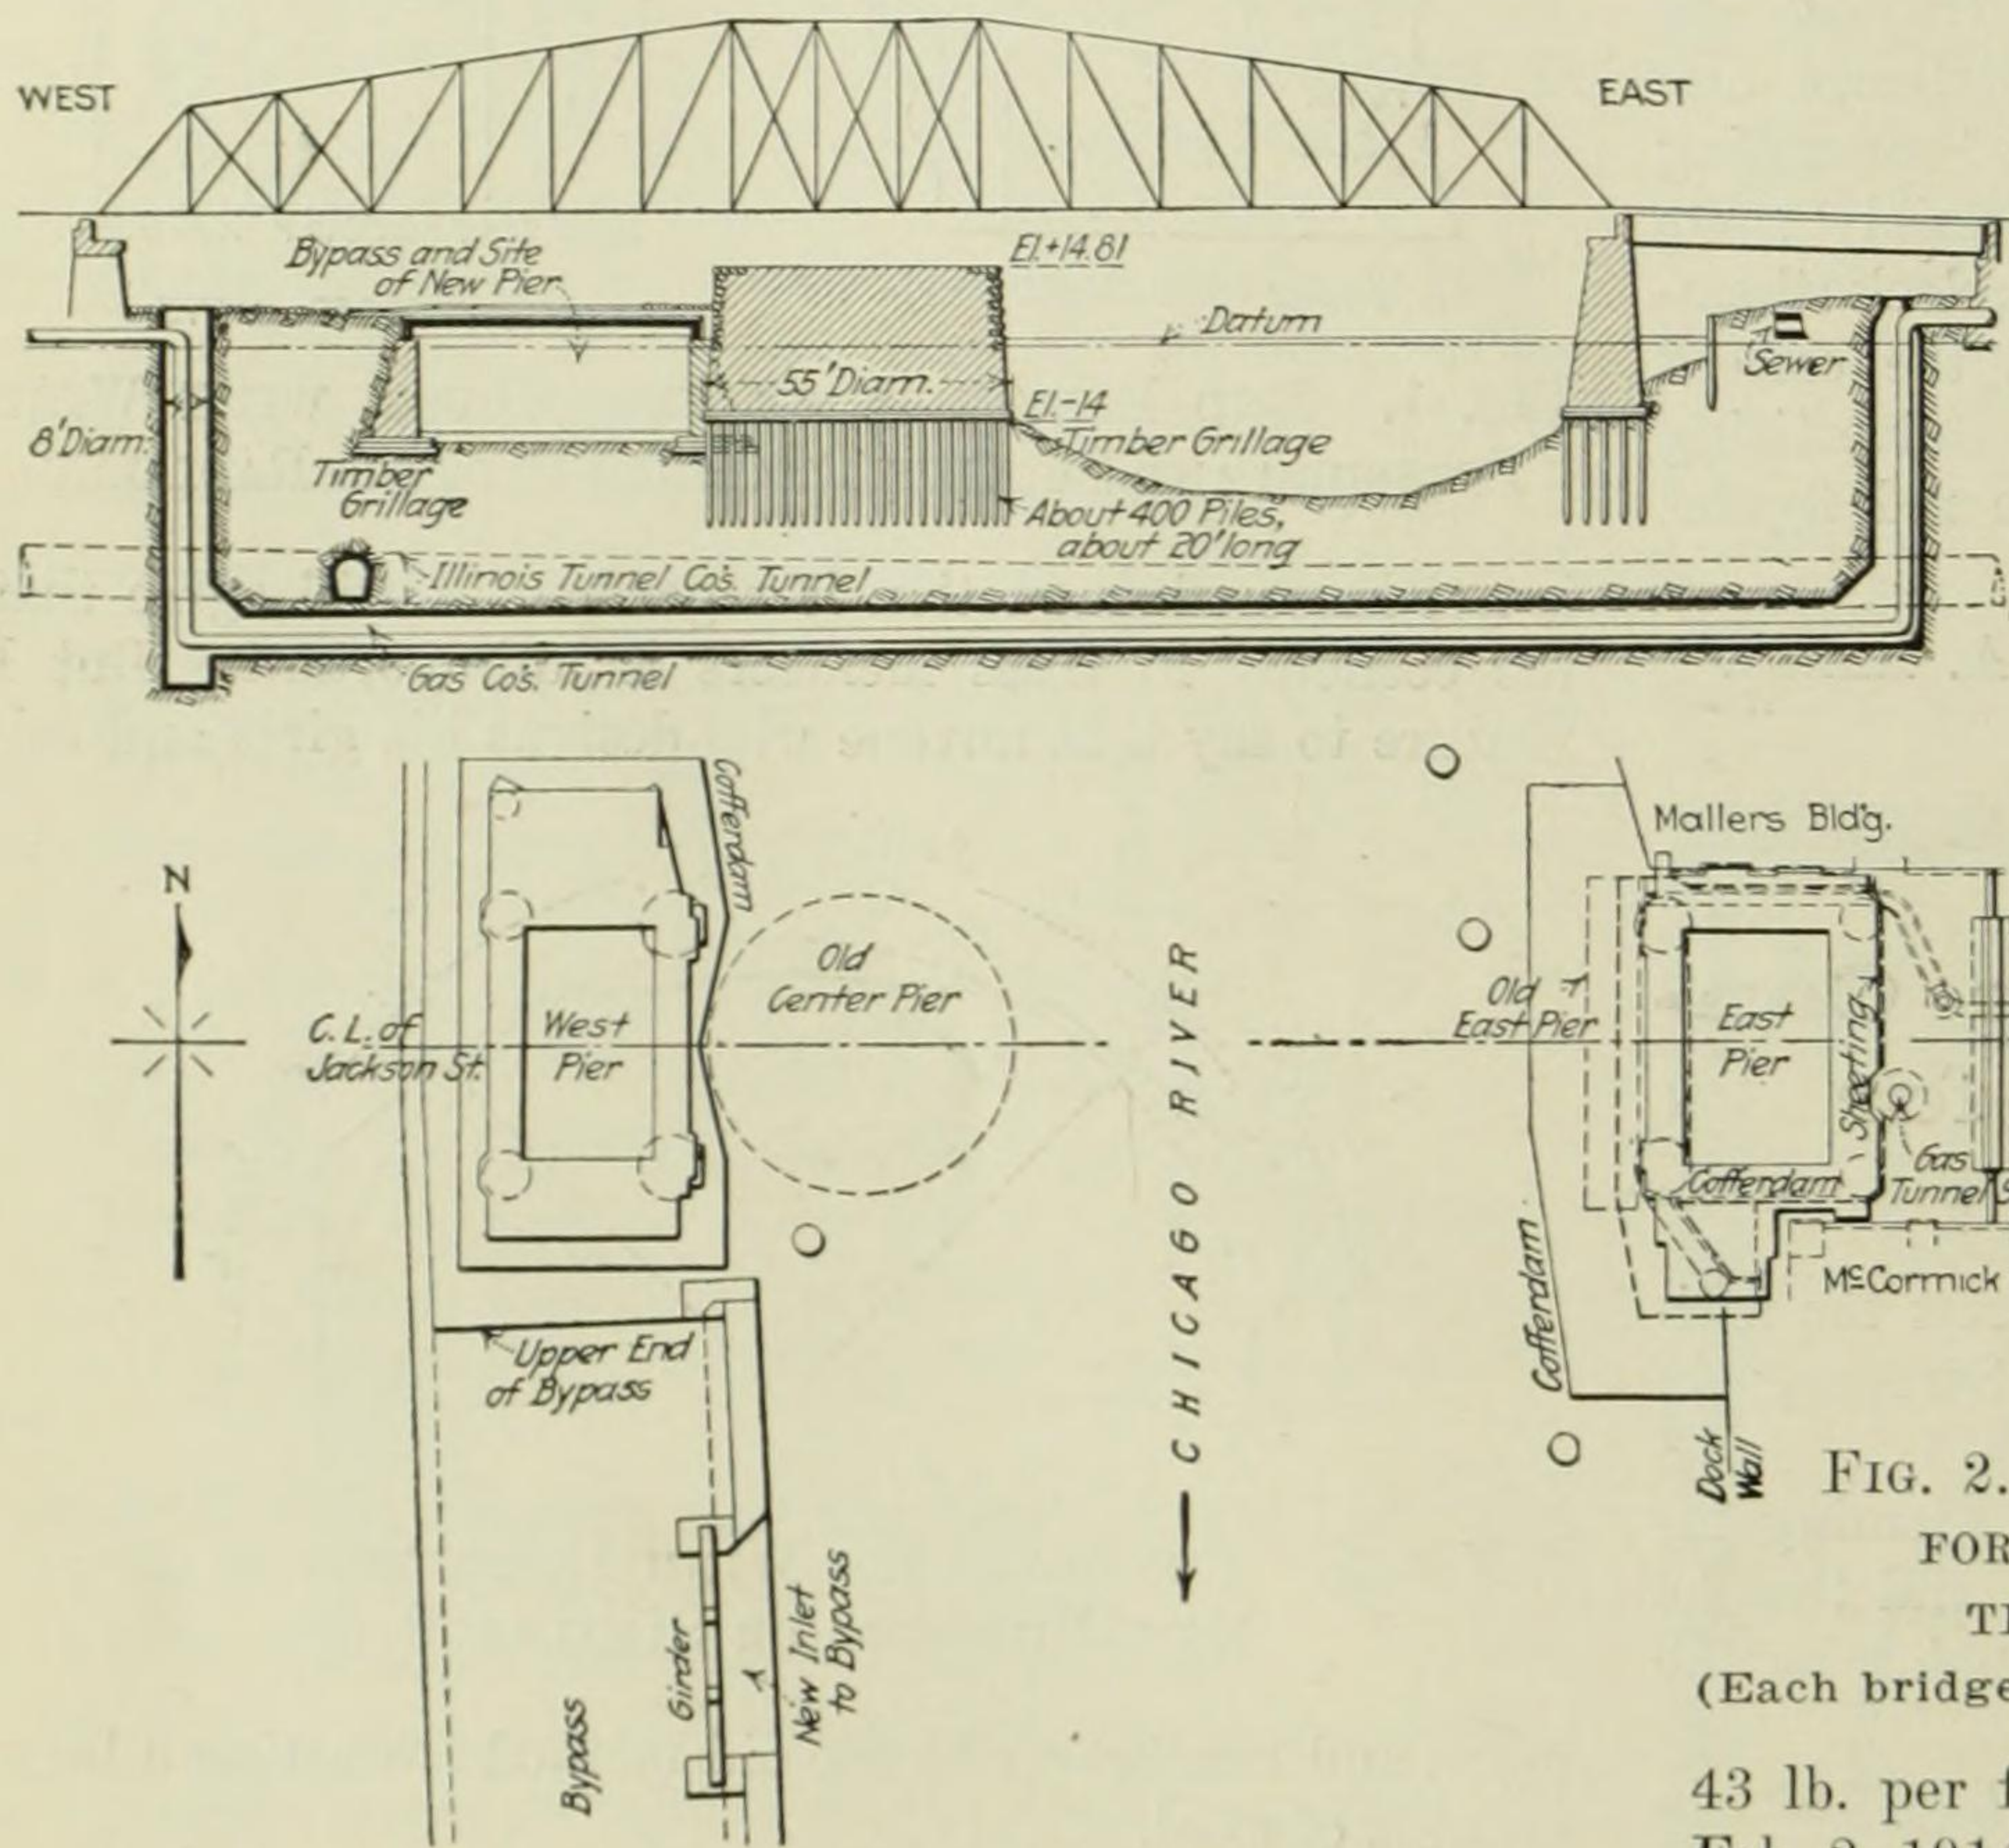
ELEVATION AND PLAN OF OLD AND NEW SUBSTRUCTURES OF THE JACKSON ST. BRIDGE AT CHICAGO
